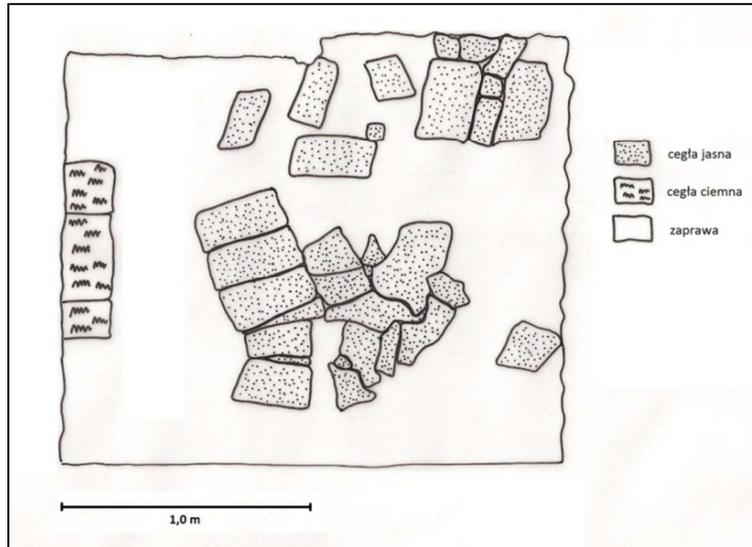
A draft of bricks' arrangement (plan) from the second fragment of a wall. (Cegła jasna- light brick, cegła ciemna – dark brick, zaprawa- daub)
